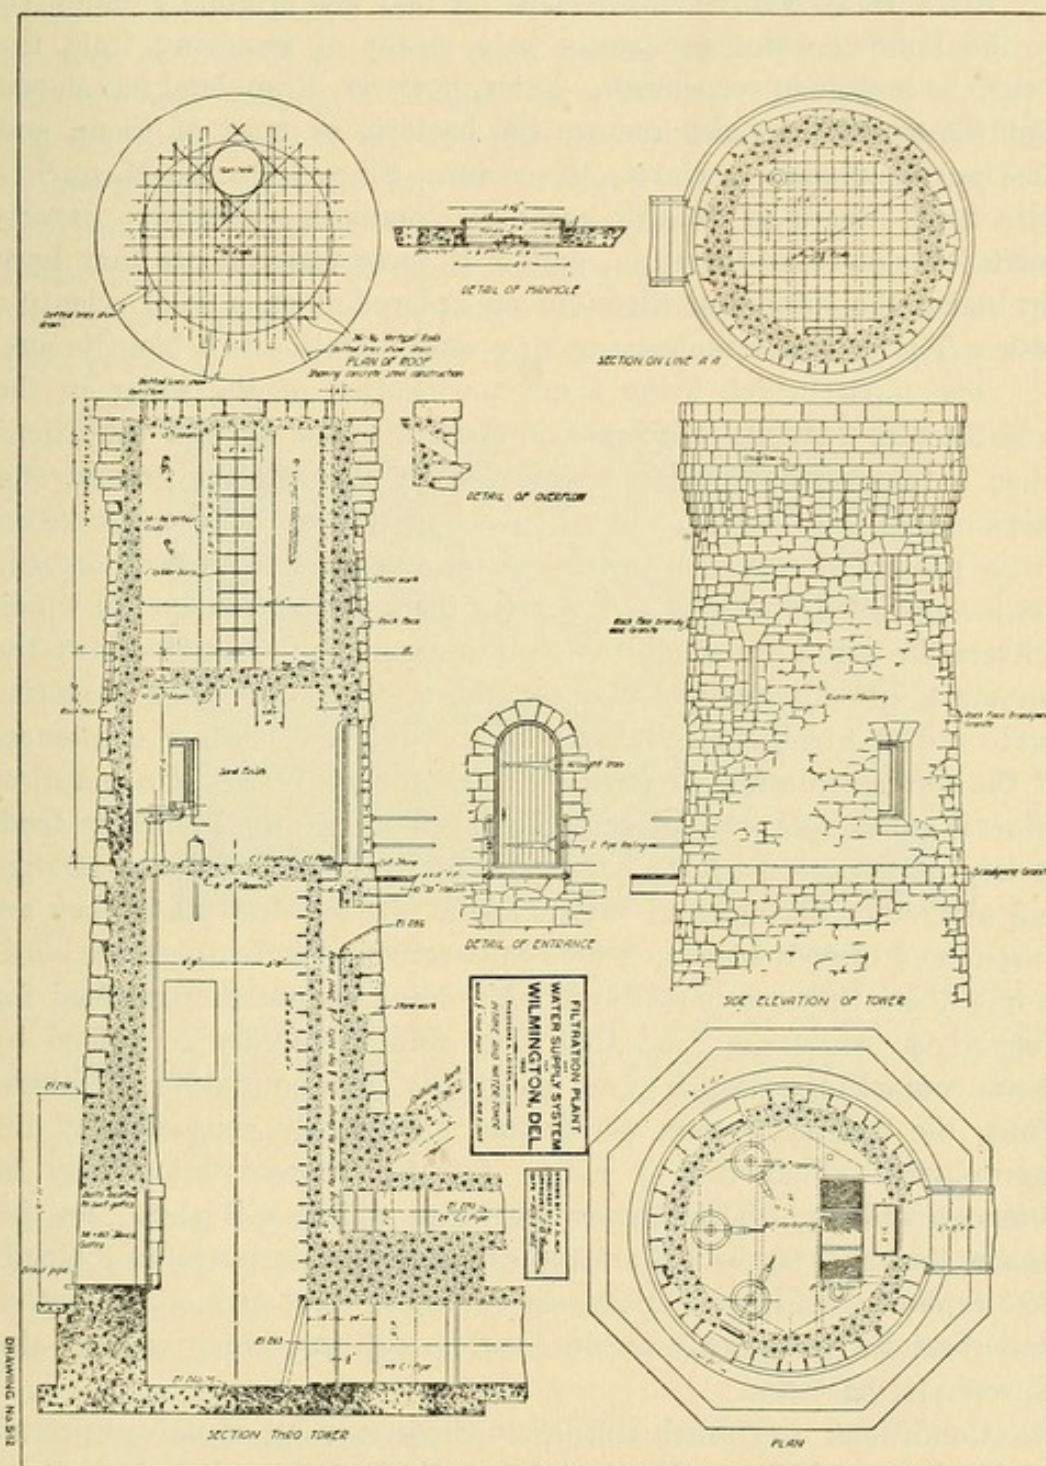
Plans of Intake and Water-tower Used in Connection with the Reservoir.
